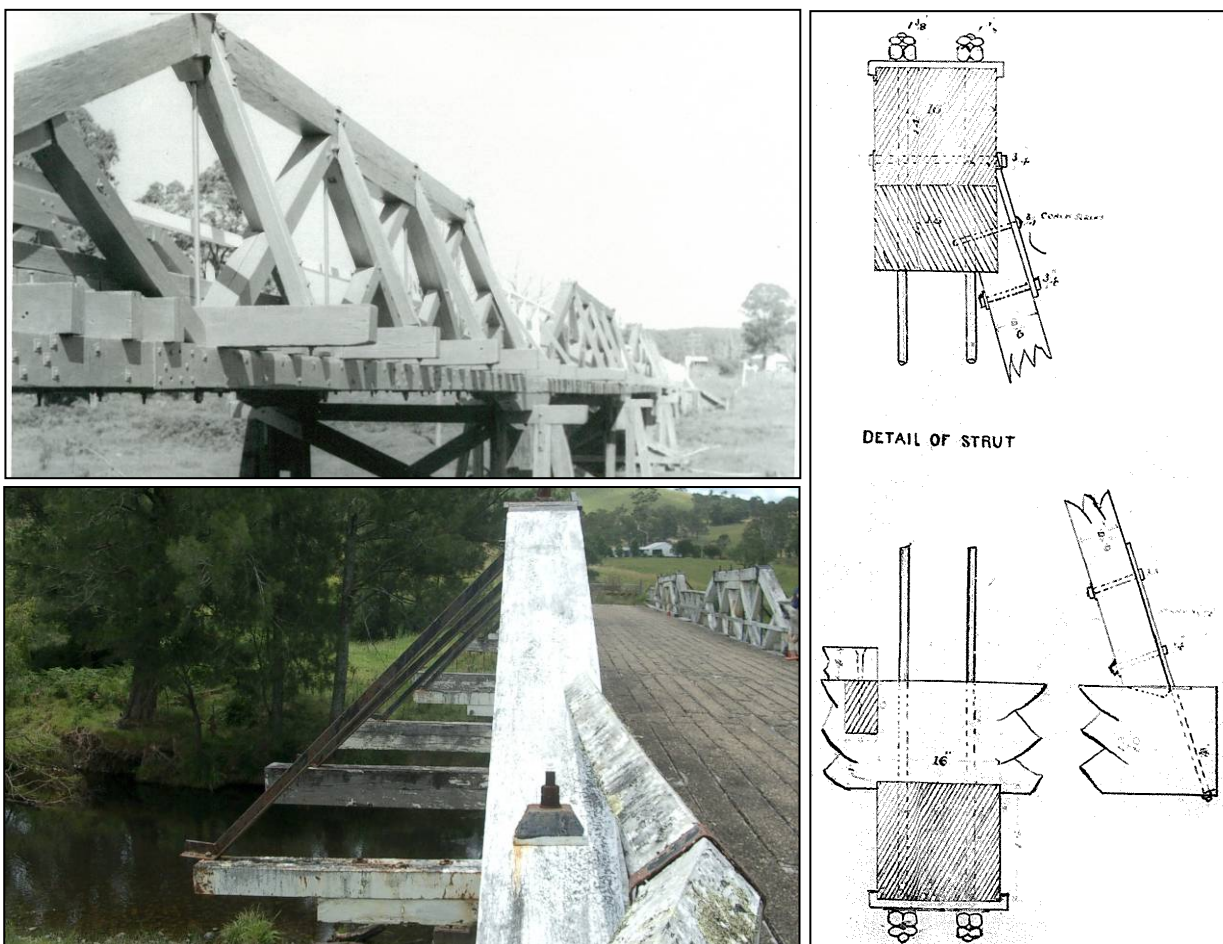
Change from Original Timber to Steel Sway Bracing on Monkerai Bridge
